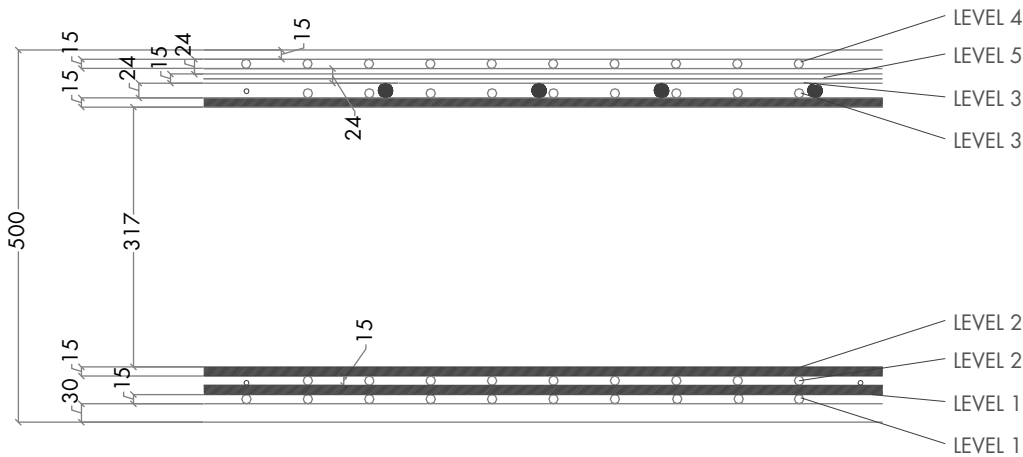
Examples of reinforcement distribution in a section of the isolated plate.
